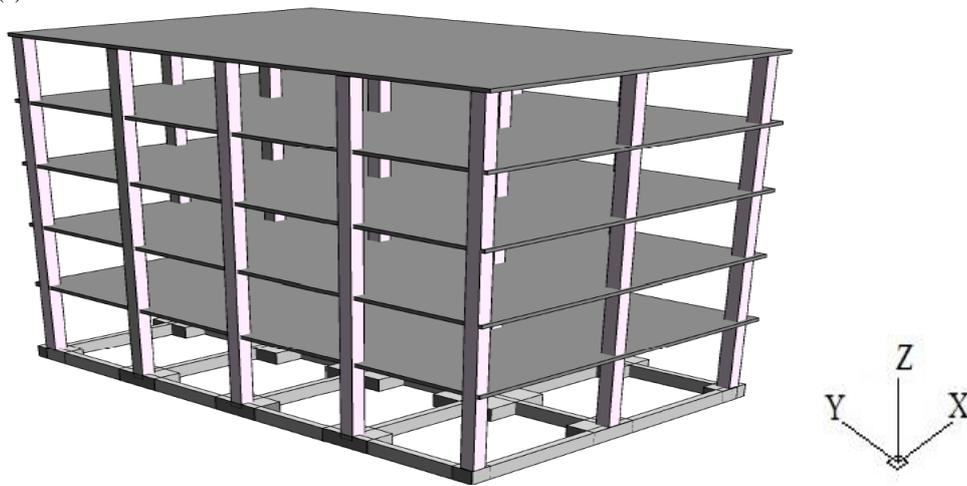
3D superstructure supporting on isolated footing connected with tie beam.
